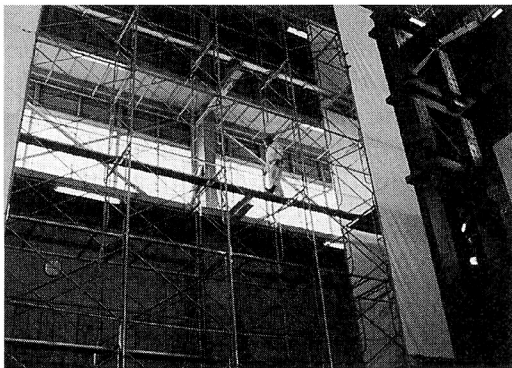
View of the experiment: The test being carried out is with a 240 mm-wide footing board.
